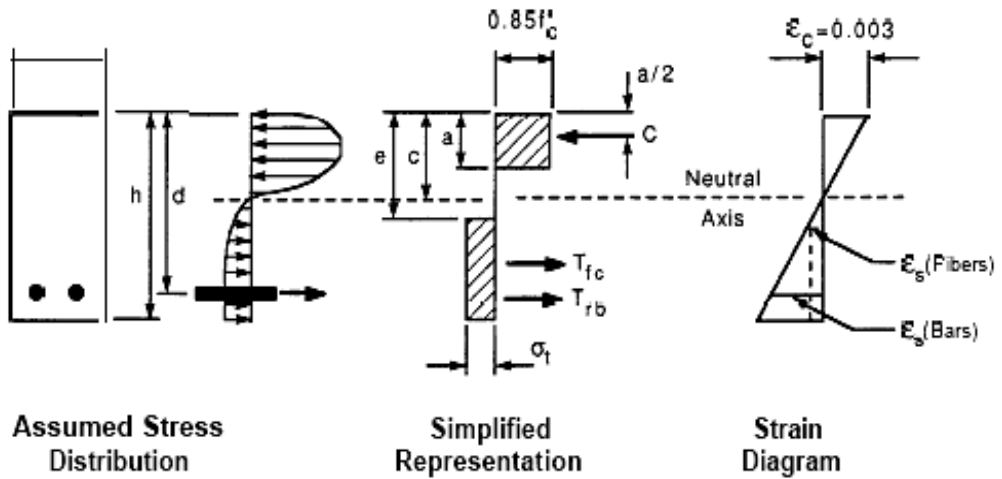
Design assumptions of reinforced concrete beams containing steel fibers [6].
